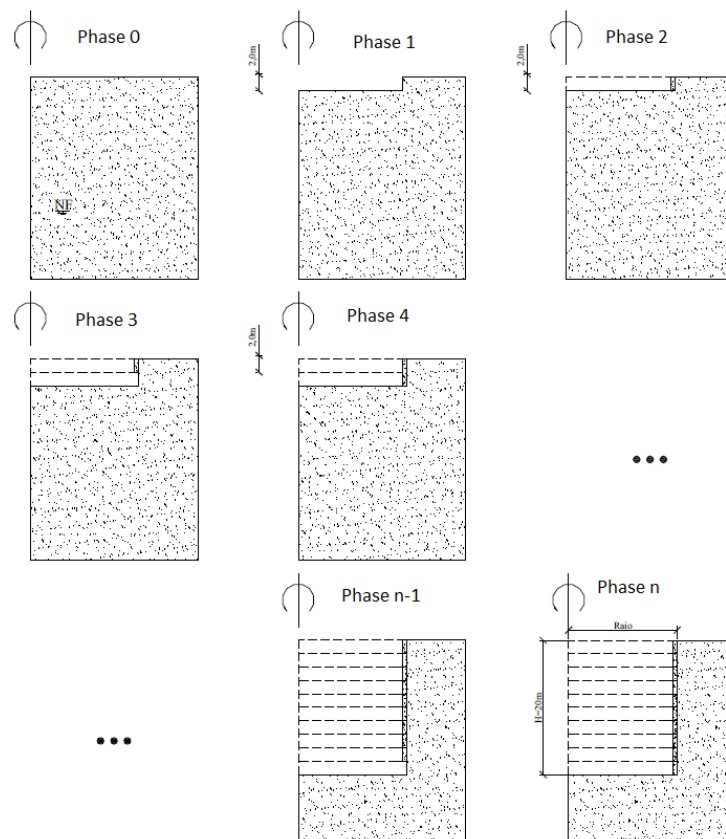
SEM: Sequential excavation-support steps (adapted from Topa Gomes (2008))
